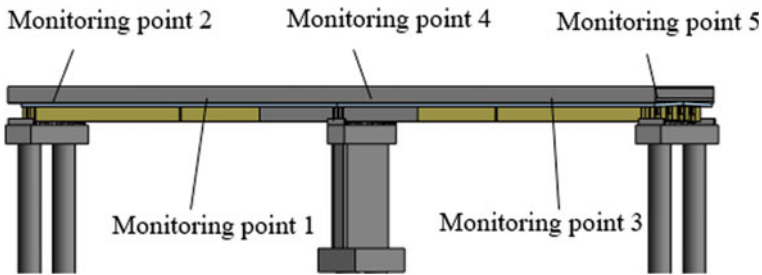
Deployment diagram of monitoring points of the steel-concrete composite girder bridge
